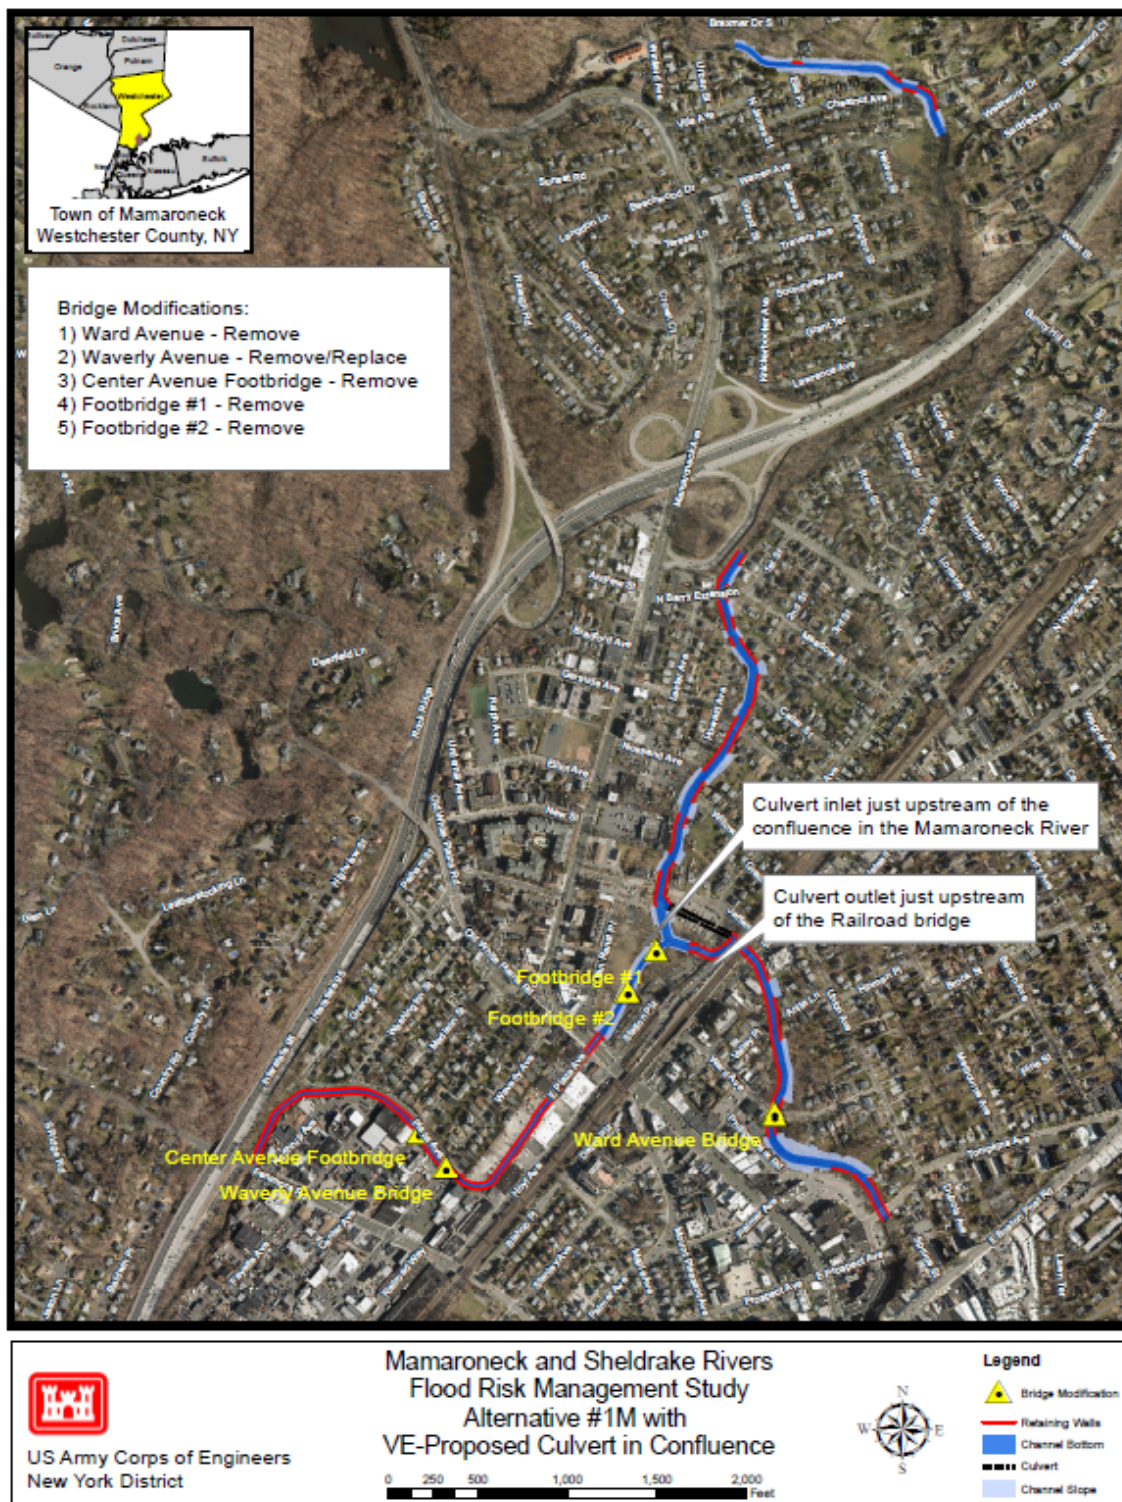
Alternative 1M | Plan View with the VE Proposed Culvert in Confluence
